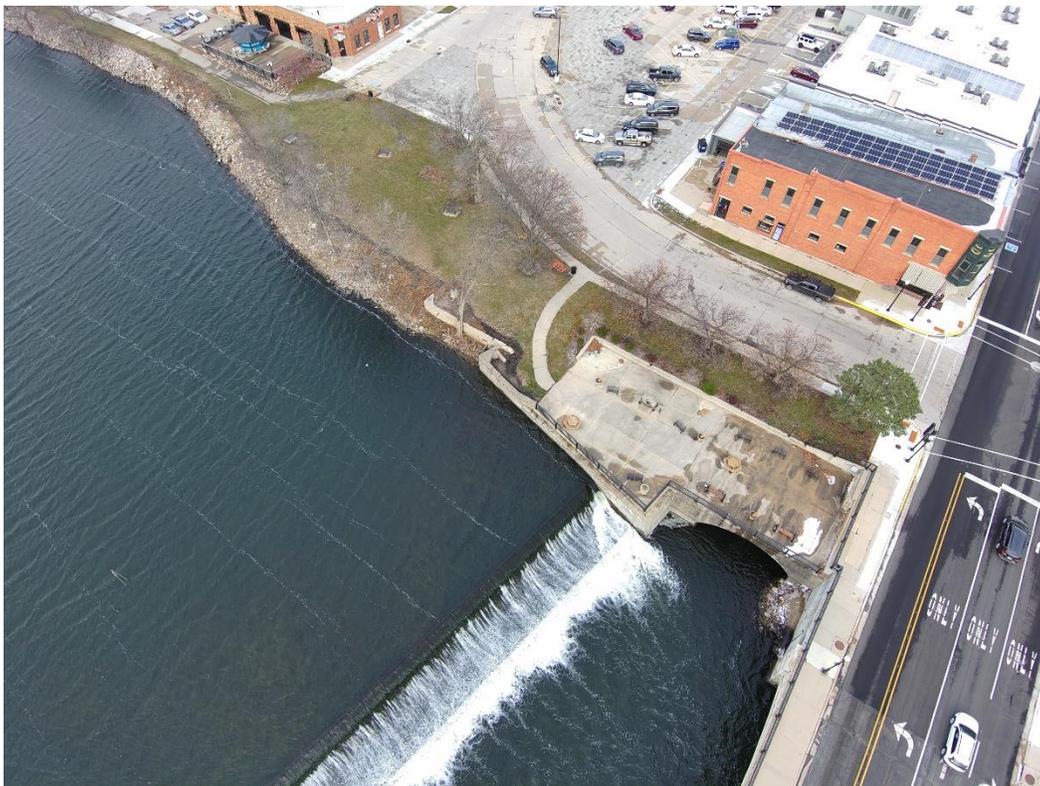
NORTHWEST SHORELINE LOOKING NORTHWEST
